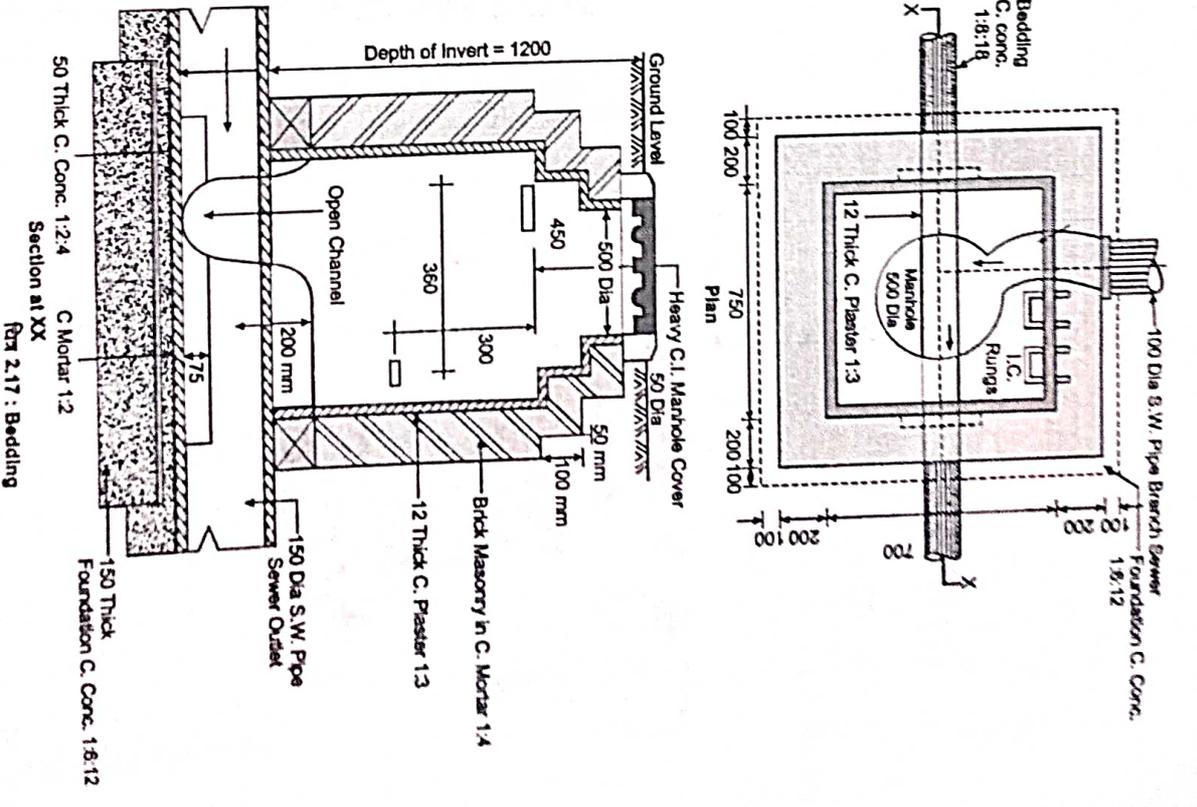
Section and Plan of Manhole with Intercepting Trap
